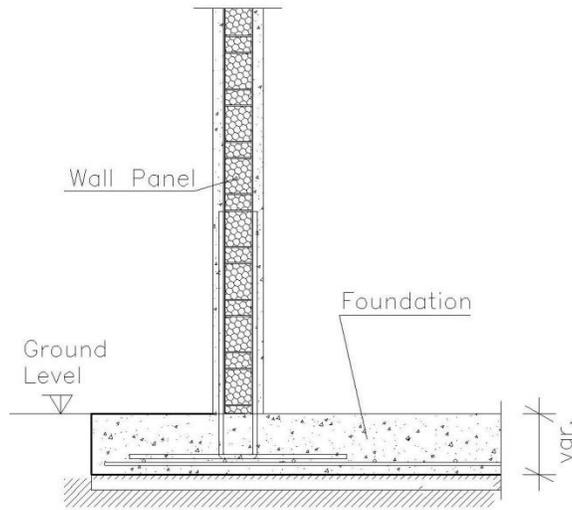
TYPICAL WALL PANEL TO FOUNDATION CONNECTION DETAIL
